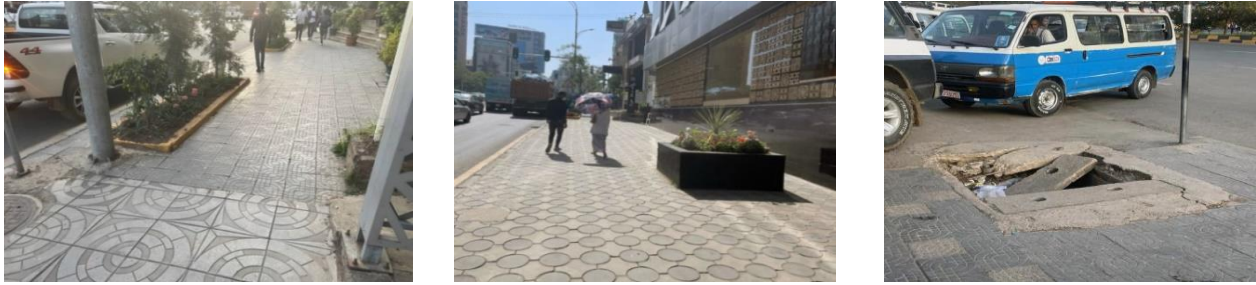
Width, Pavement Quality, and Condition of Africa Avenue Sidewalk
